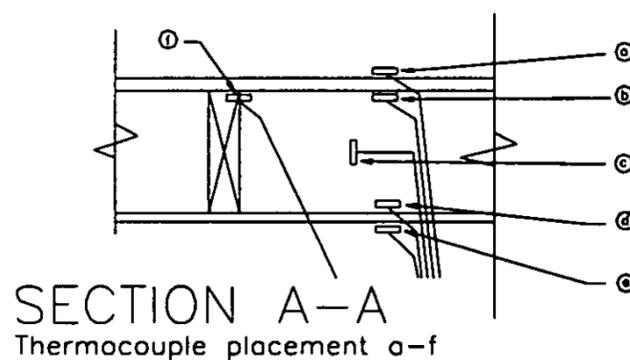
Floor section identifying location of thermocouples, full-scale test 2.
